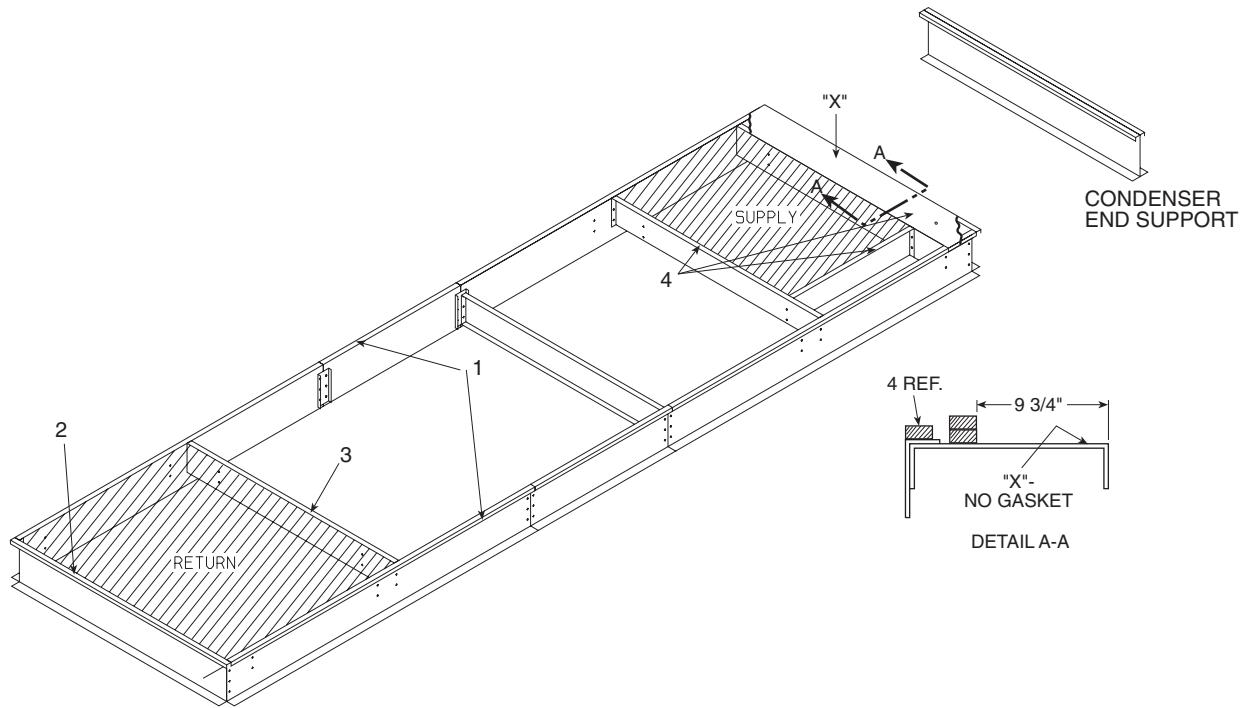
Gasket Location on Roof Curb (48ZG,ZN055-105 and 48Z6,Z8075-105 Units)
